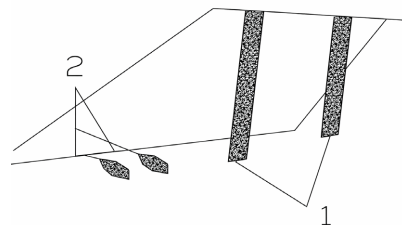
Reinforced concrete piles with anchor bolts (1—reinforced concrete pile; 2—anchor bolt).
